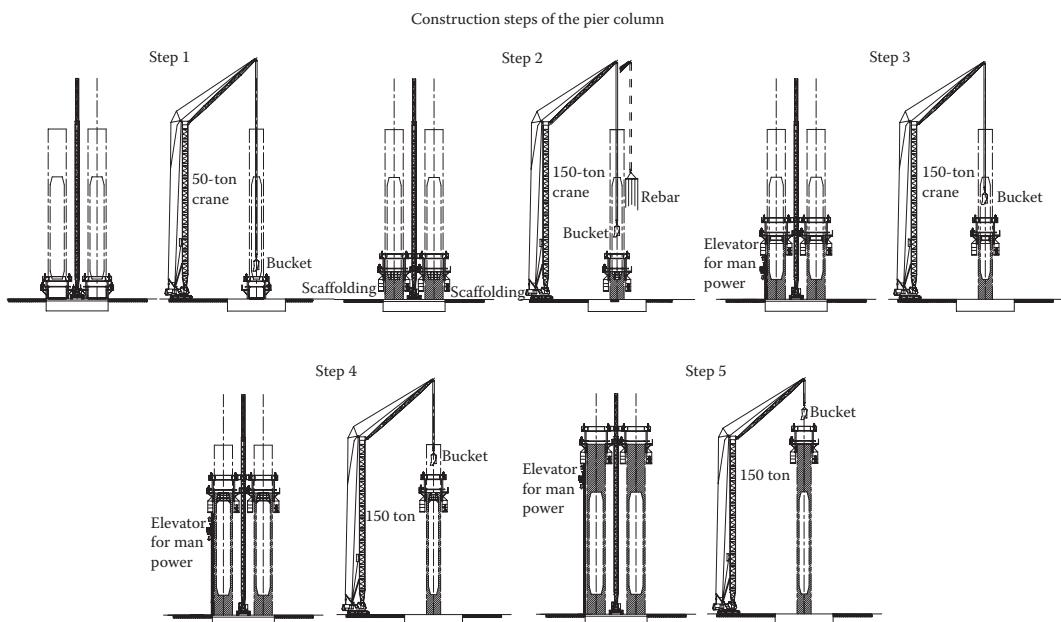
Steps 1, 2, 3, 4, and 5 of construction for Suez Canal Bridge.
